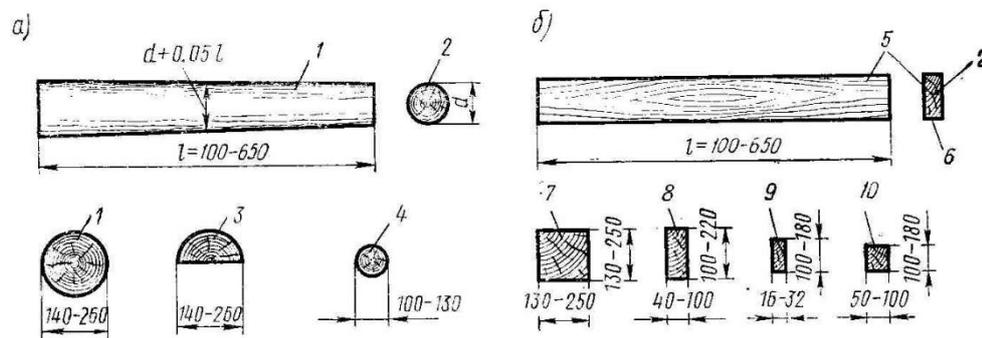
Wood materials: a) sawn; b)- circular; 1. the wide surface side of the board; side at the 2nd end; 3-thick side; 4-edged wood; 5-thick board; 6-thin board; 7th rail; 8-wooden beam; 9- a straight beam on one side; 10-cantilever beam.
